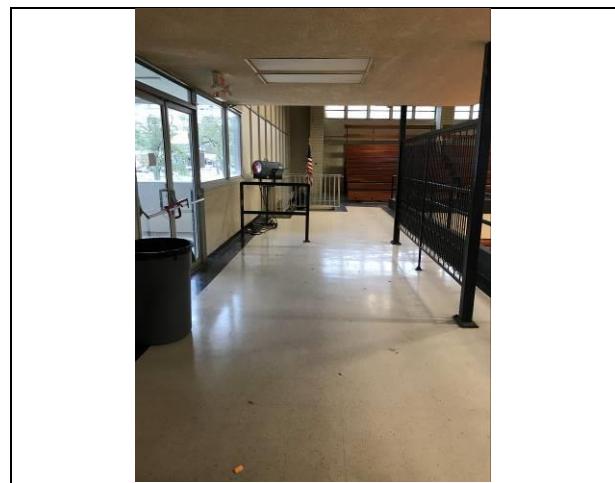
Typical interior finishes inside the 2nd floor walkway around the Davis Gym.
